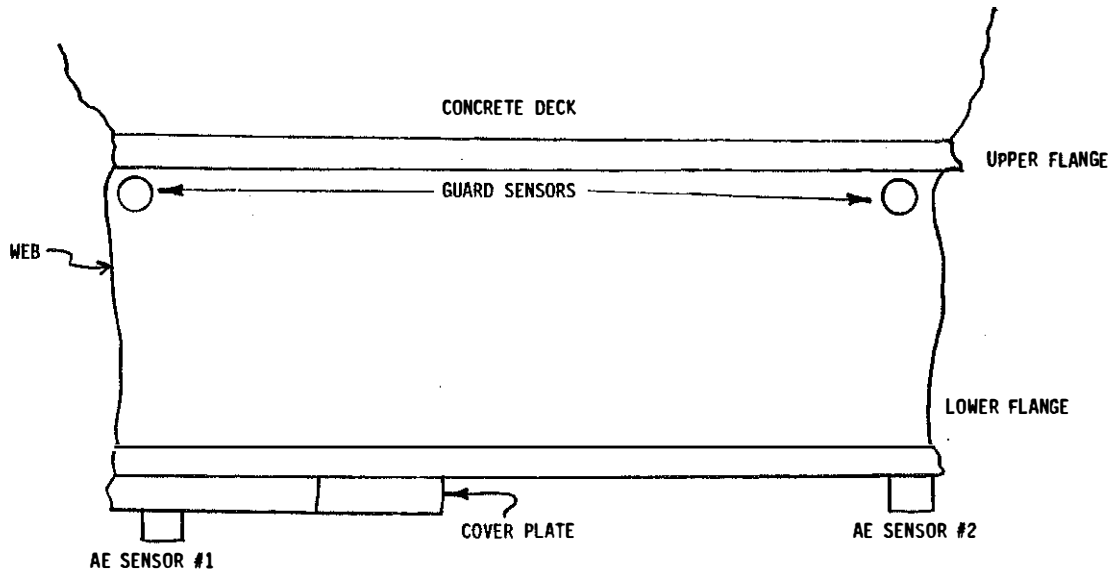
Use of Guard Sensors on a Steel Girder Bridge.
